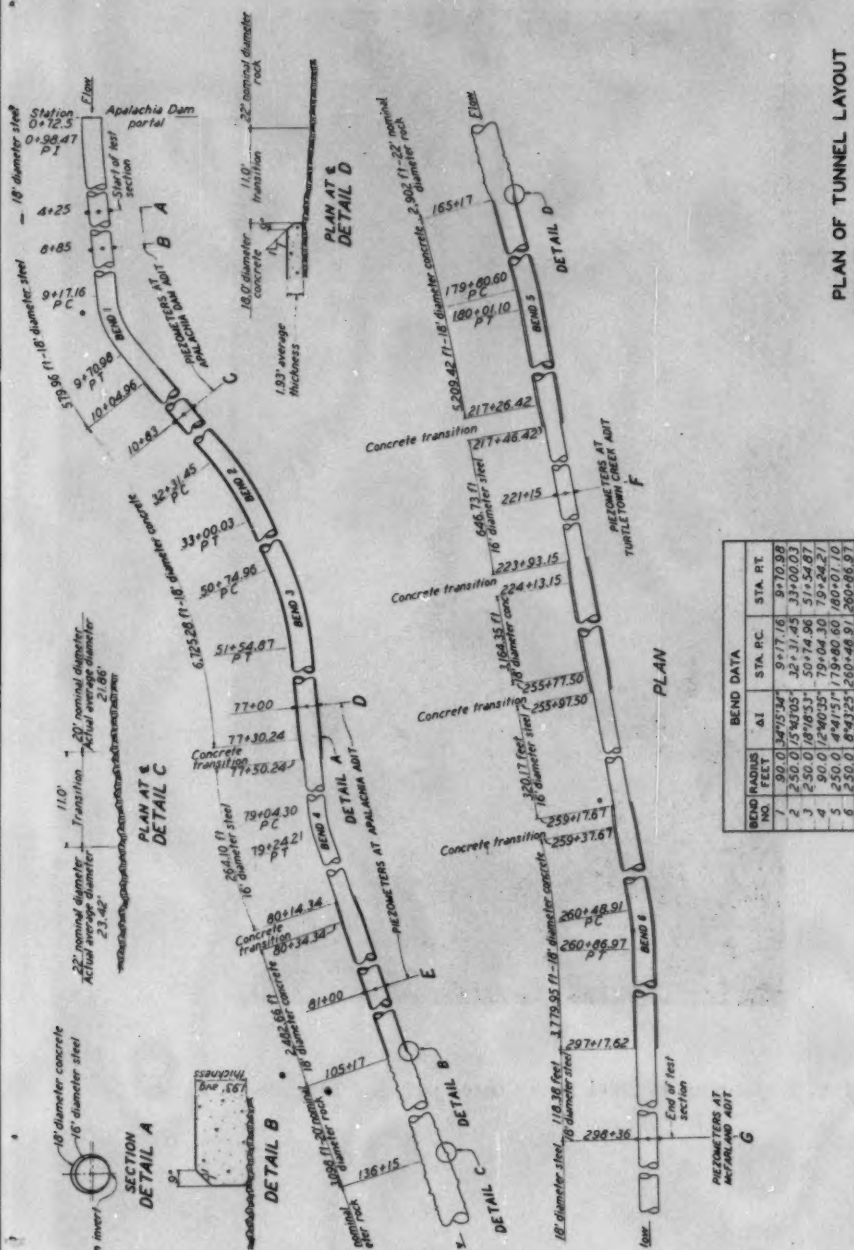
Plan of Tunnel Layout Apalachia Dam to McFarland Adit.
